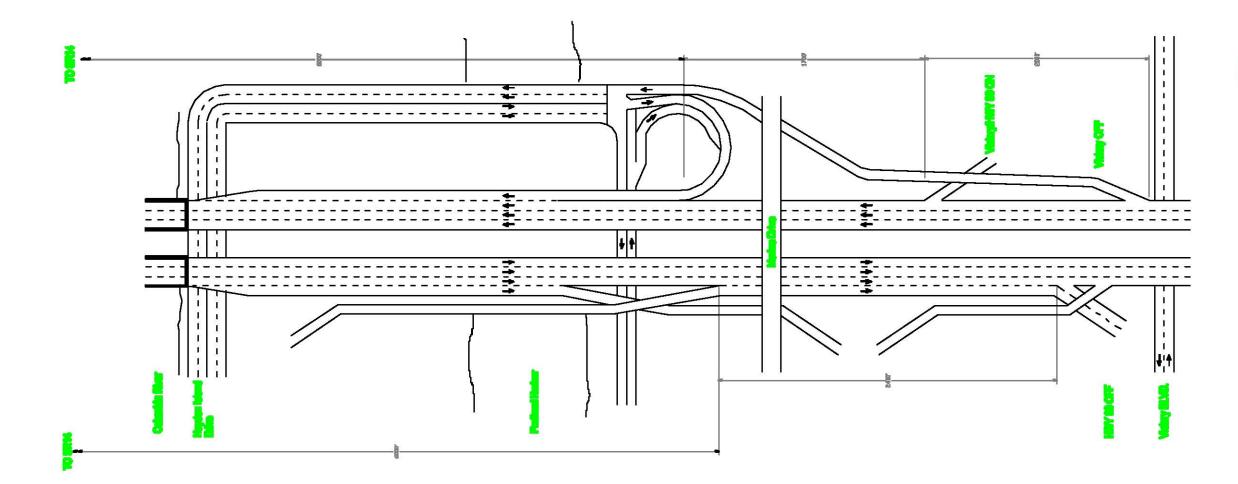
I-5 CORRIDOR CONFIGURATION WITH NEW 10-LANE BRIDGE
